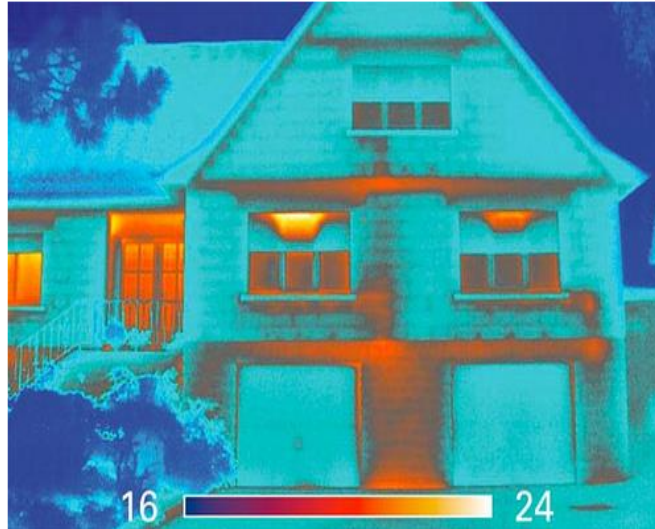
Thermal image of a building, showing a higher amount of heat loss around windows and doors [23].
